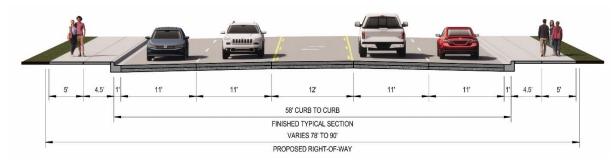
Pavement Replacement as a Wider 5-Lane Facility with Terrace and Sidewalk (From the Proposed Location of Olympus Road to Pilgrim Drive), facing north
